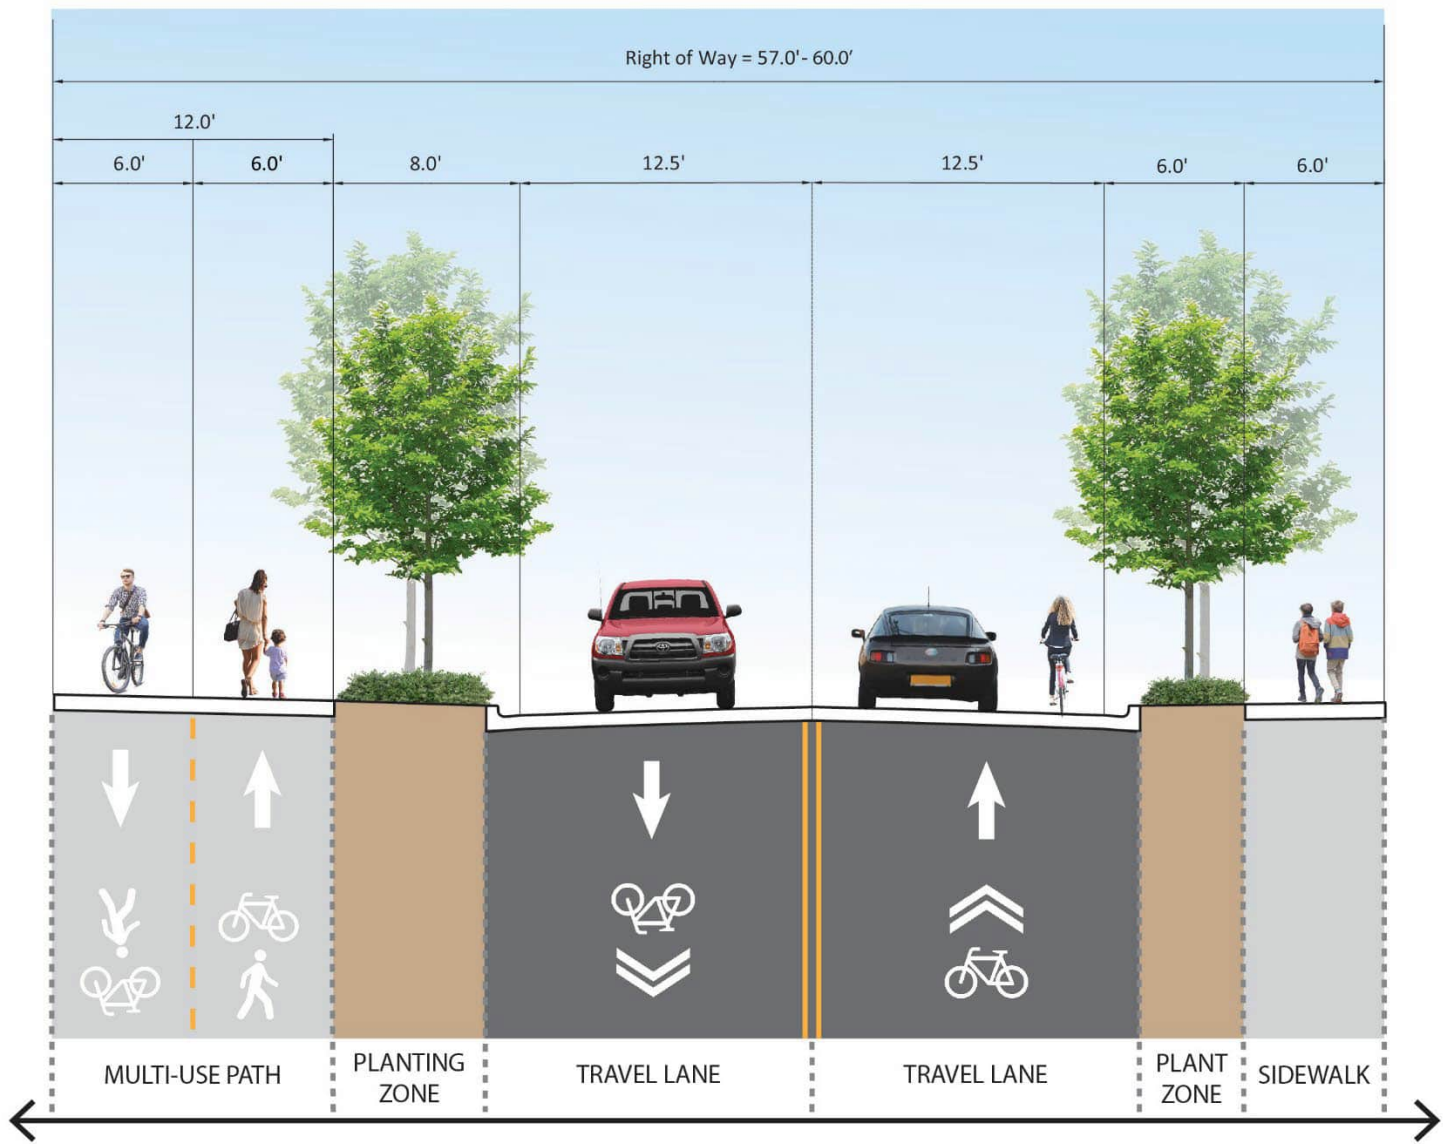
Proposed Division Avenue Cross Section at Intersection Location
